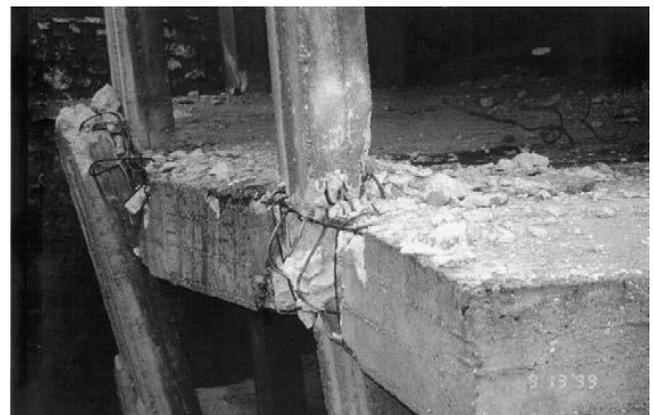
Typical View of Beam-Column Joint Failure (Reference: www.researchgate.net)
